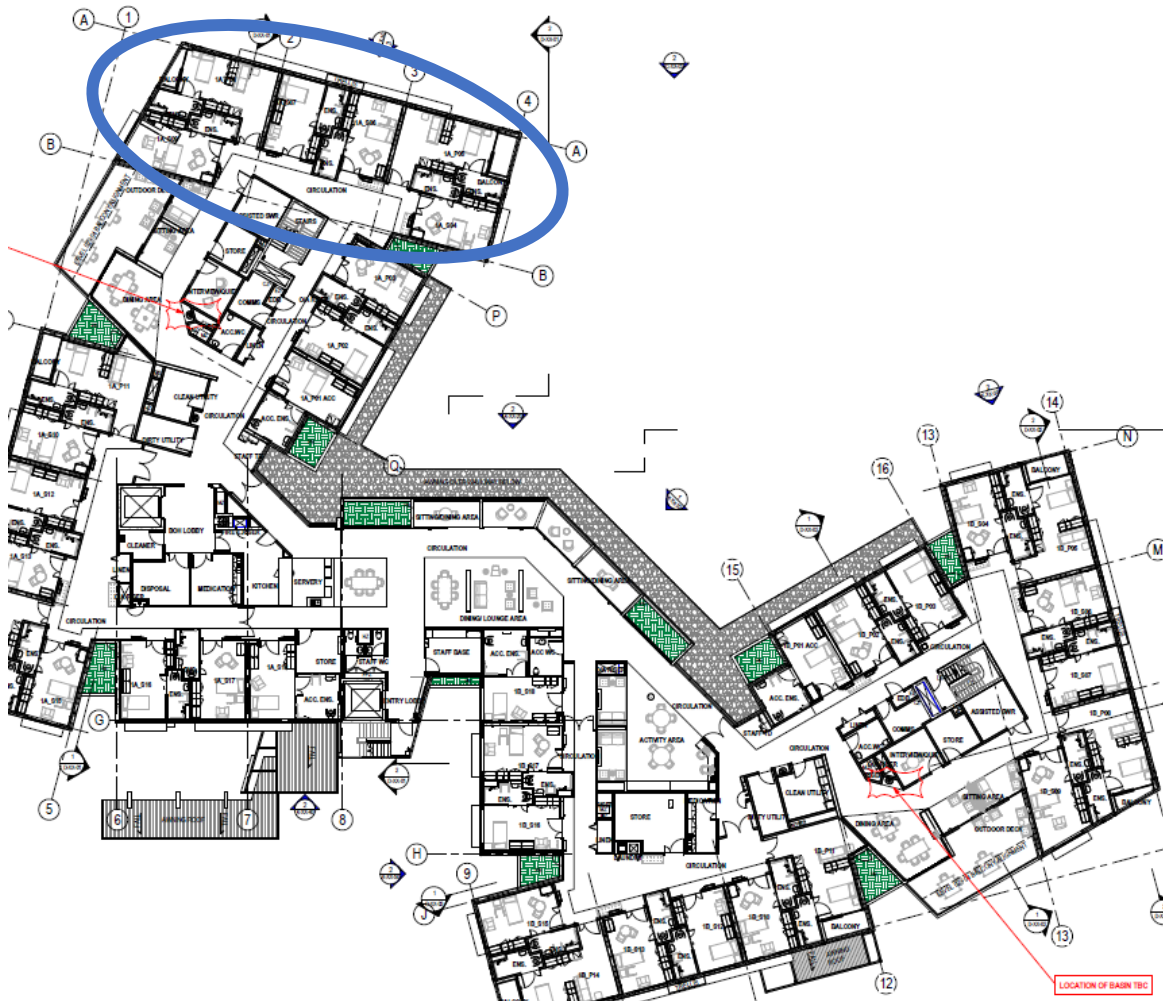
Typical RAC floor – levels 3-5, with ‘living lab resident rooms’ circled
